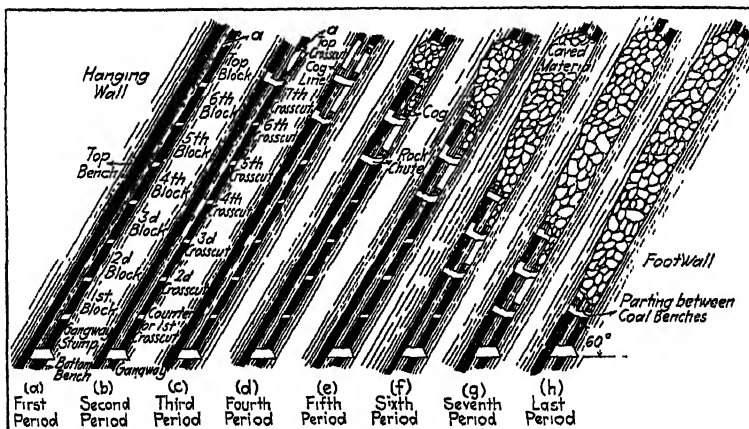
TRANSVERSE SECTIONS THROUGH PILLARS OF UPPER AND LOWER BENCHES, BIG BEN SEAM, CARBONADO, SHOWING STAGES OF DRAWING THE PILLARS.
